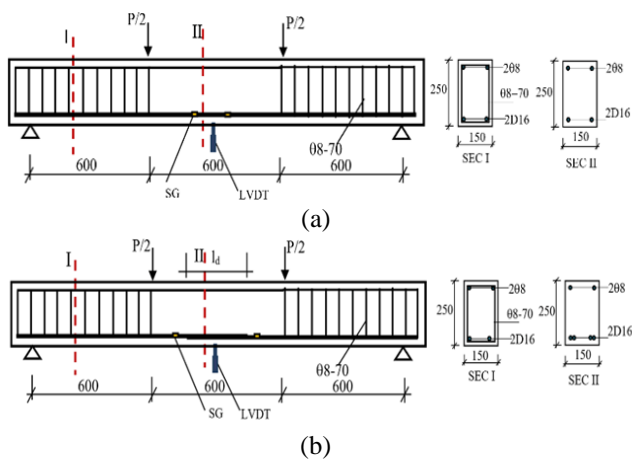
(a) Control beam (b) splice beam with their reinforcements detail
